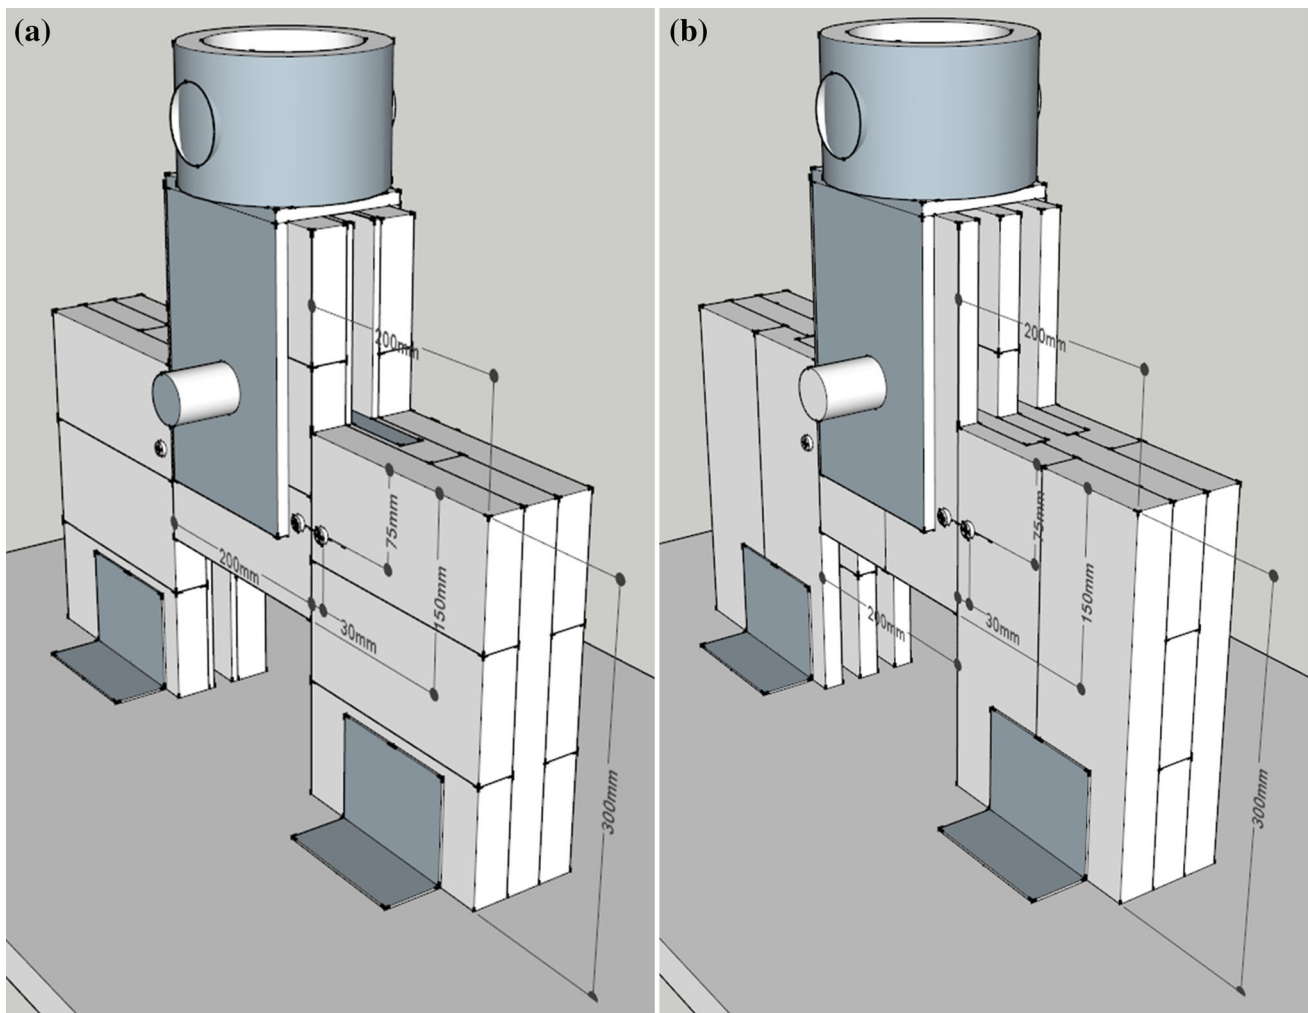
Test setup for shear performance measurement of panel-to-panel connection. a Vertically extending connection. b Horizontally extending connection
